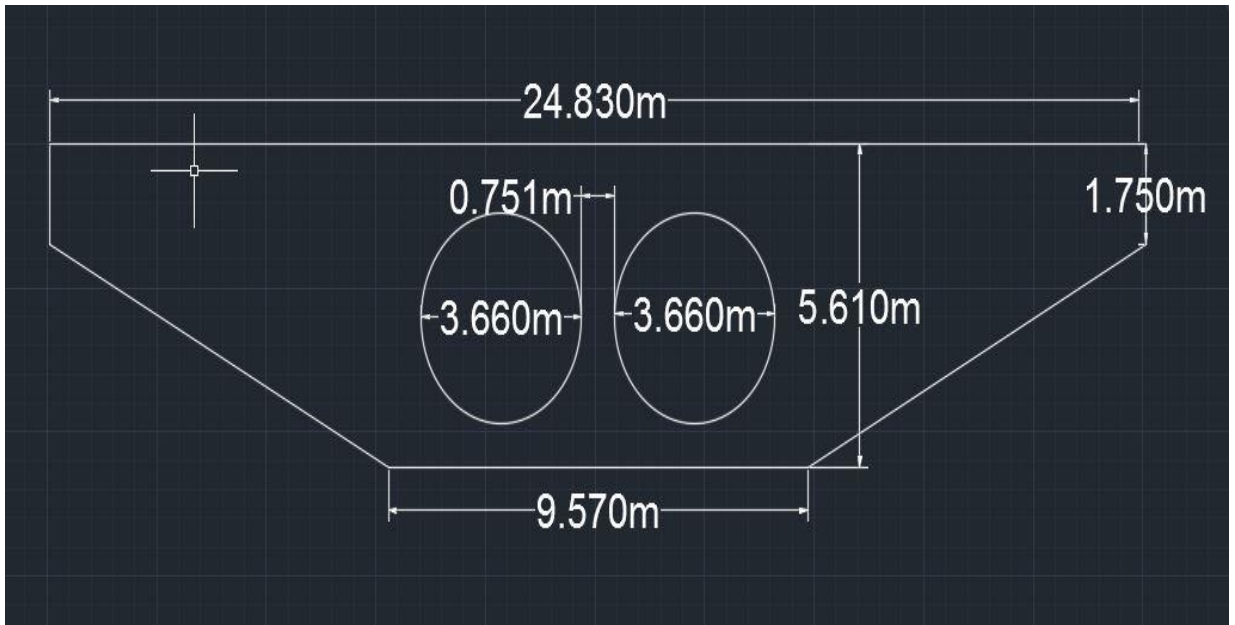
Side View of Excavation Area with Shoring and Dimensions
